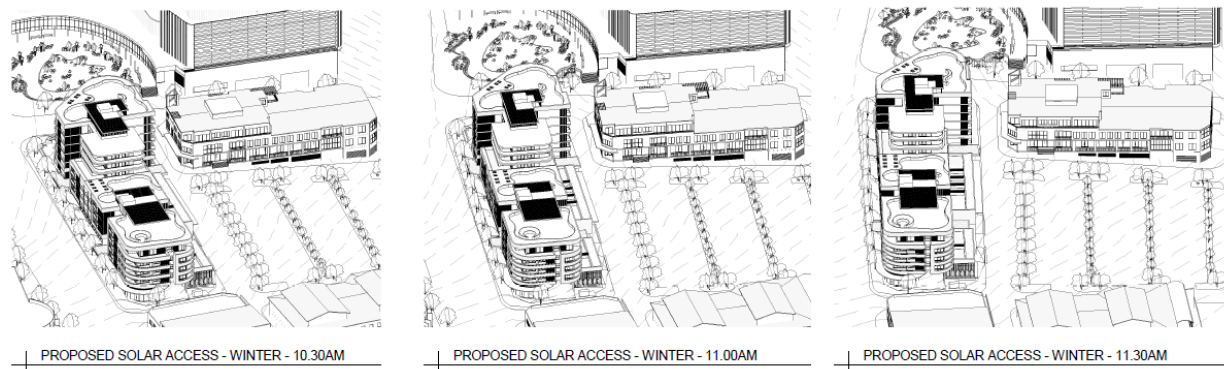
Extract from Sun Views Plans mid-winter 10.30am to 11.30am (Source: DWA Architects)
